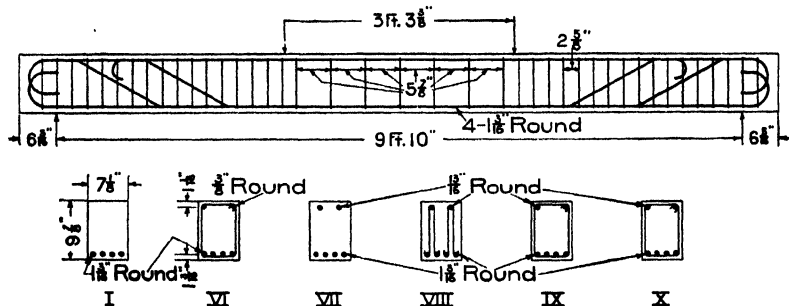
Dimensions of Beams, Stuttgart Tests. (See p. 428.)
